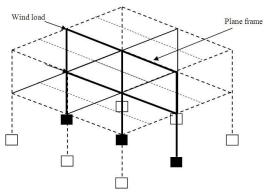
Layout of a 2-bays and 2-storeys braced plane frame
